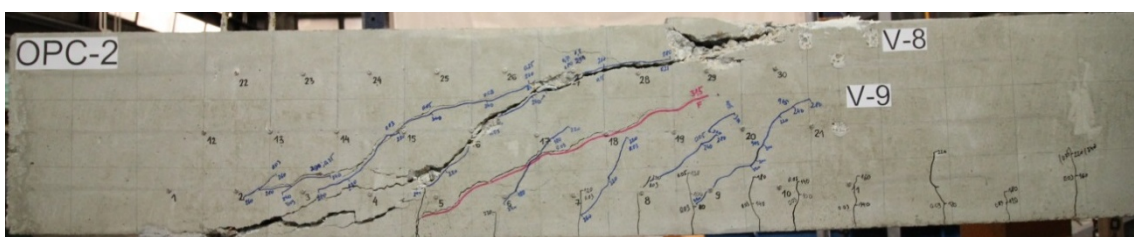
Crack pattern in the front side of the OPC-2 beam after failure
